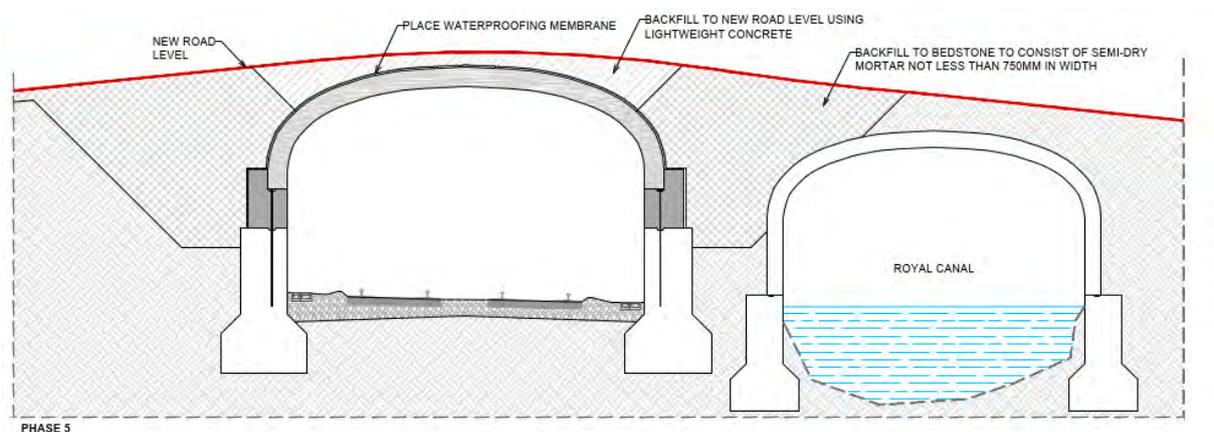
Placement of waterproofing membrane and backfill to bedstone behind vertical walls
